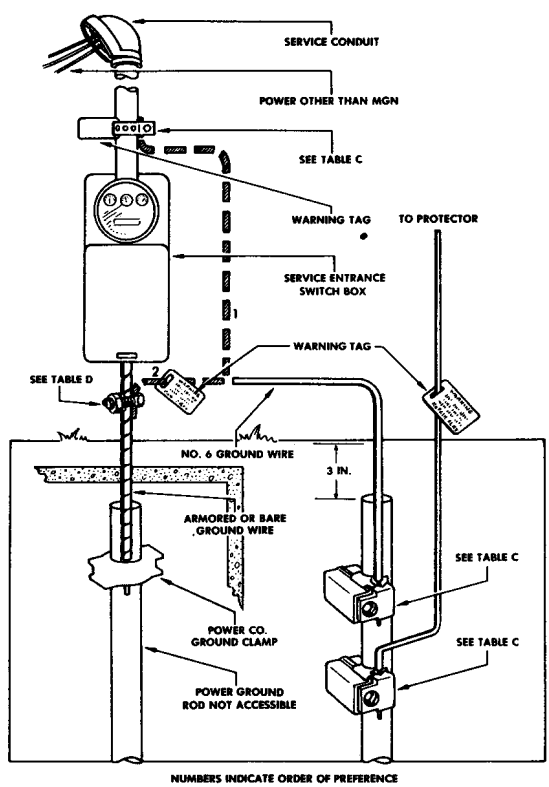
Power Other than MGN Grounded to Inaccessible Ground Rod—No Water Pipe
